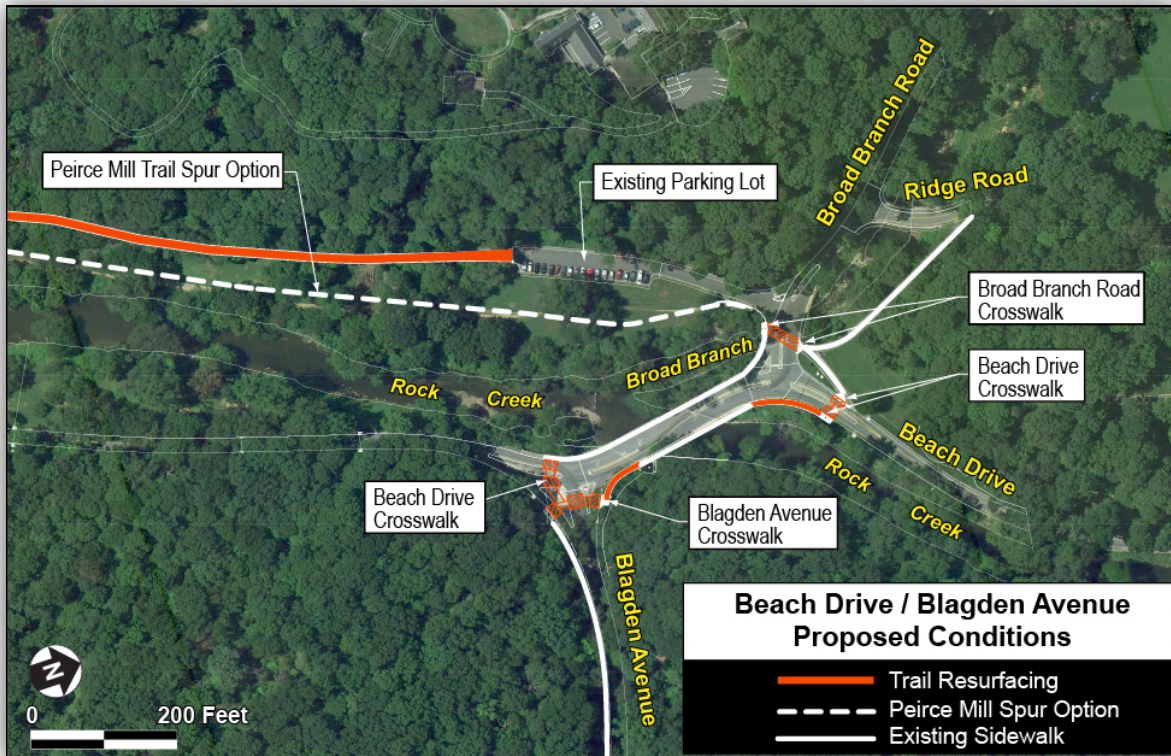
Proposed Crossings at Beach Drive and Blagden Avenue
